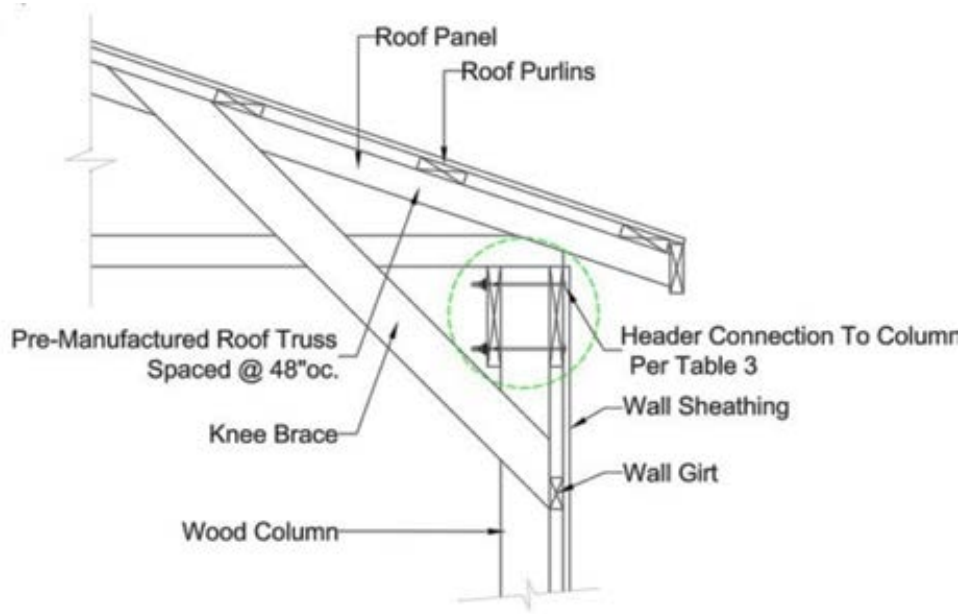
THRULOK™ SCREW BOLT FASTENING SYSTEM – ROOF TO HEADER DETAIL
